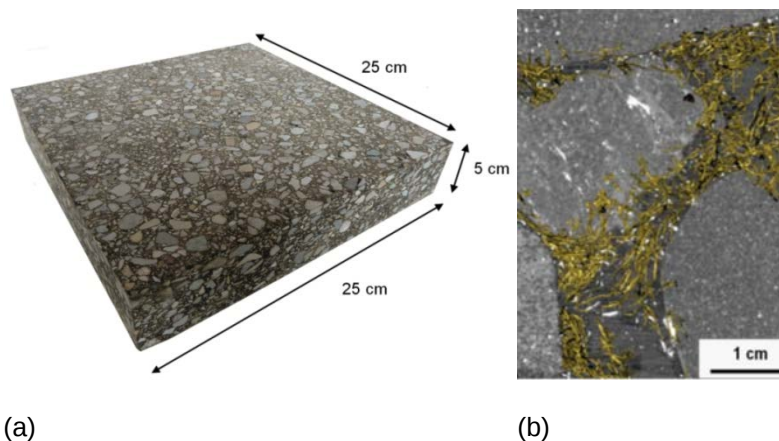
Asphalt mixture slab (a) and detail of steel wool fibers type 00 distributions in asphalt concrete (b).
